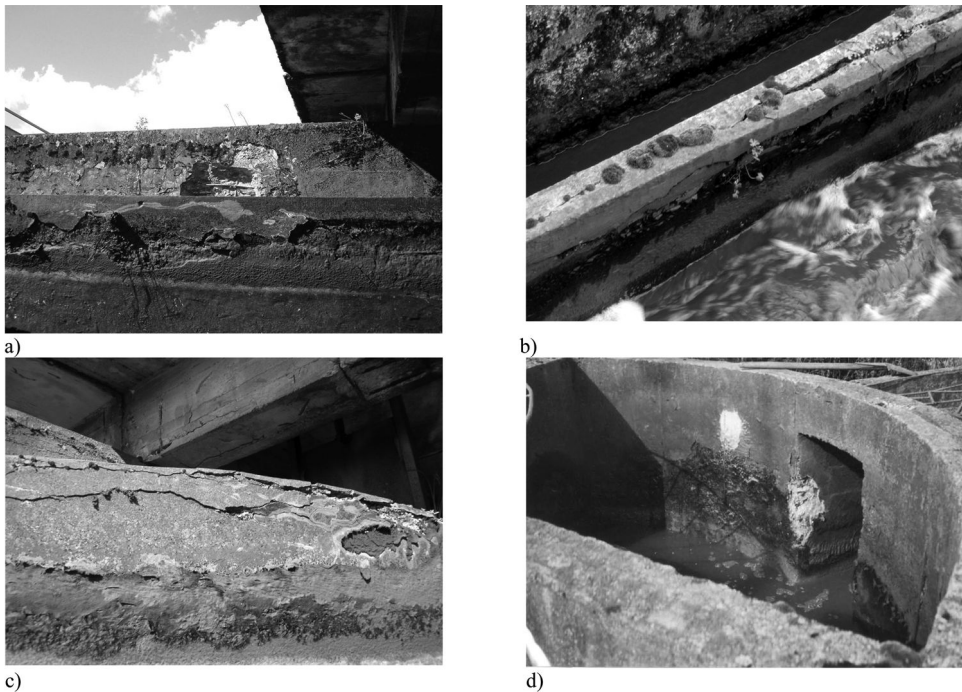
Typical damage of RC structures of sewage-treatment plant: a) wall and top edge; b) open channel (technological supply sewer); c) connection of platform with chambers; d) sludge well.
